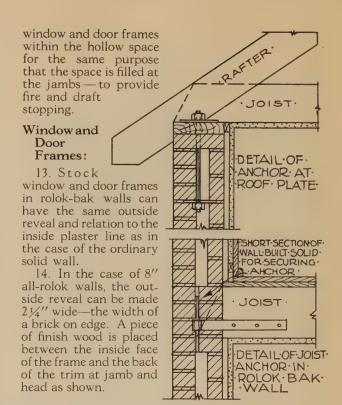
Anchors of any type can be built into Ideal walls and secured by constructing a small part of the wall solid.
